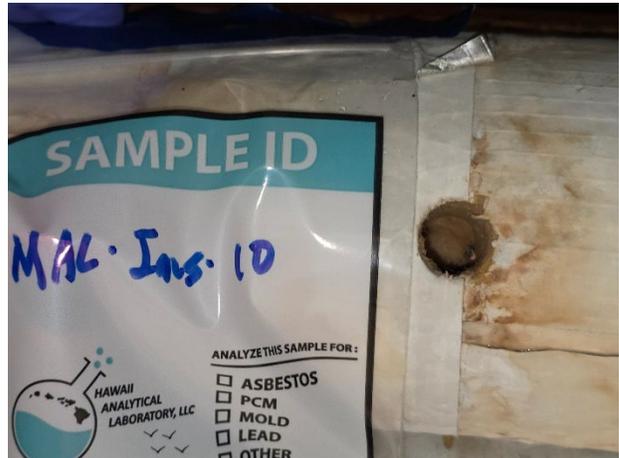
Sample ID: MAL-Ins-10 Stained white wrap and yellow insulation, Above Drop Ceiling. Recreation Room.
